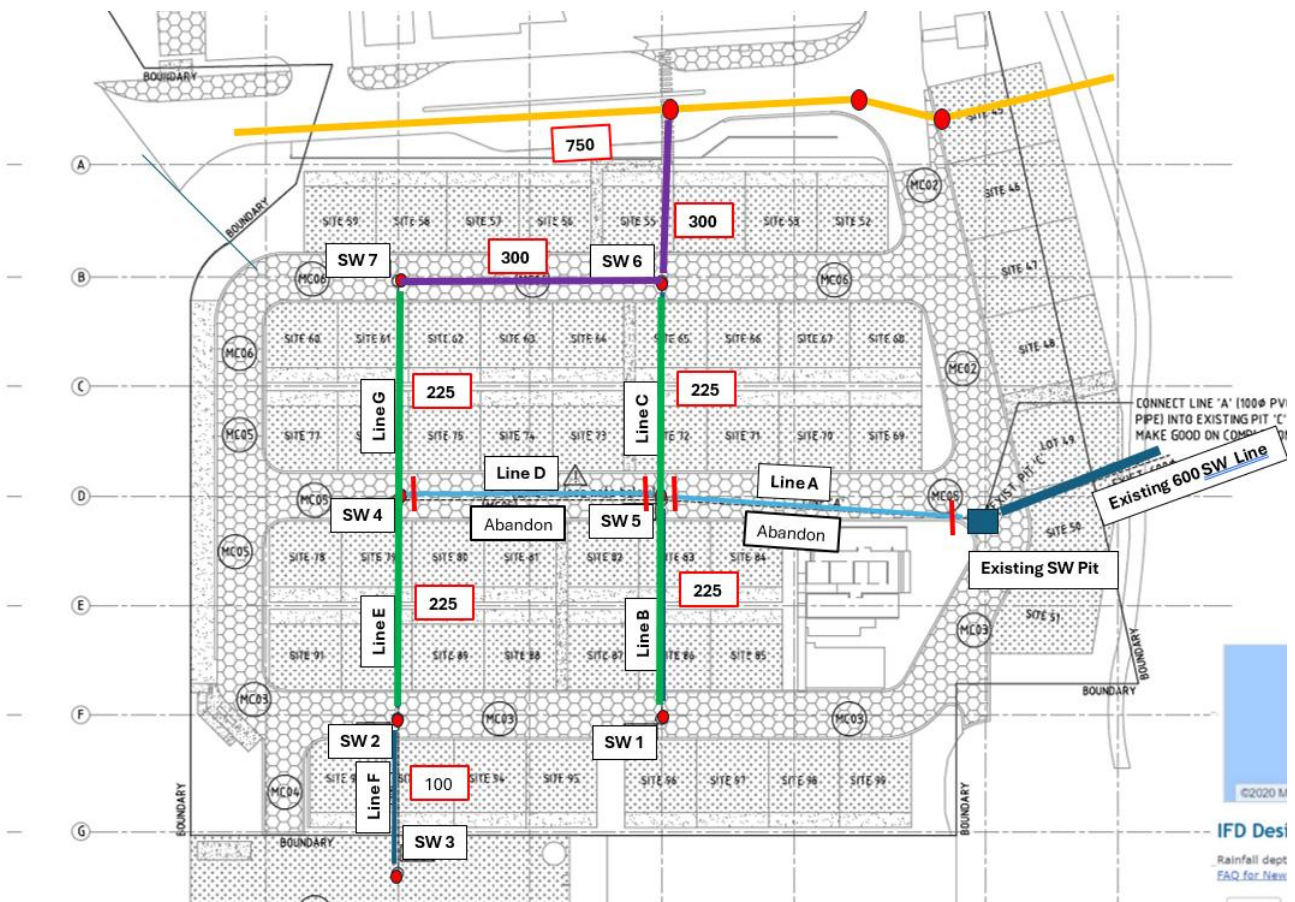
Stage 2 Ocean View Caravan Park - Proposed Stormwater Works
